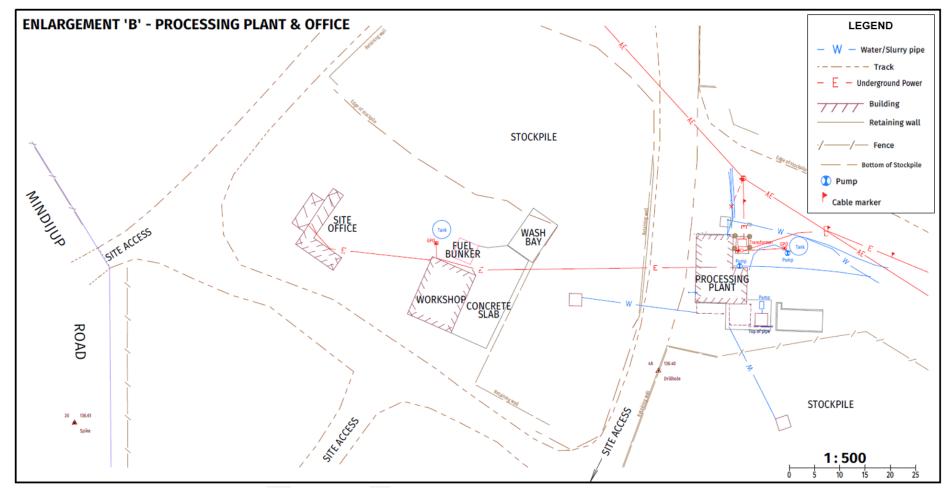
A detailed layout of the processing plant and infrastructure (site office, workshop, roads, pipelines, pumps and tanks) in close proximity to the processing plant.
